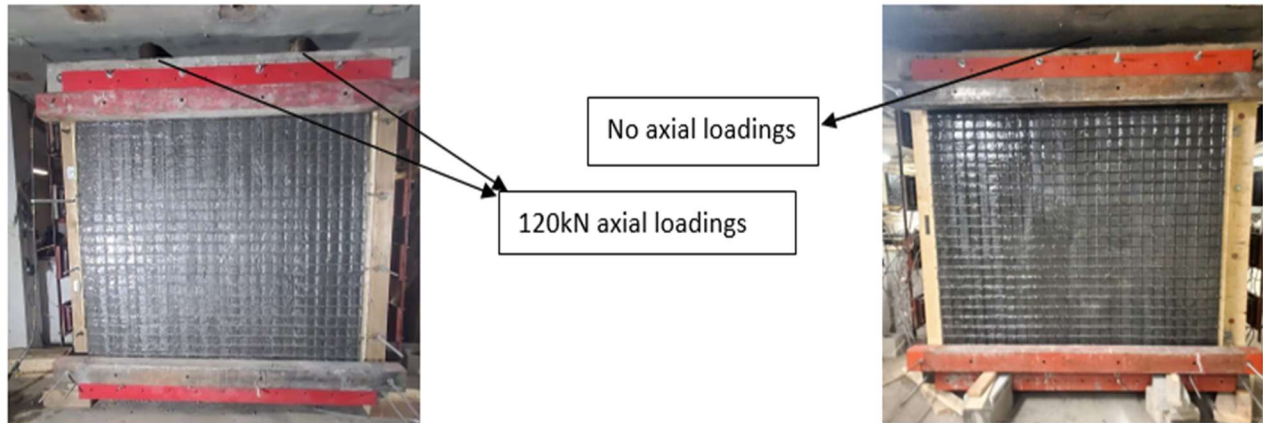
(a) Retrofitted wall with axial loading (load bearing) (b) Retrofitted wall without axial loading (non-load bearing)
